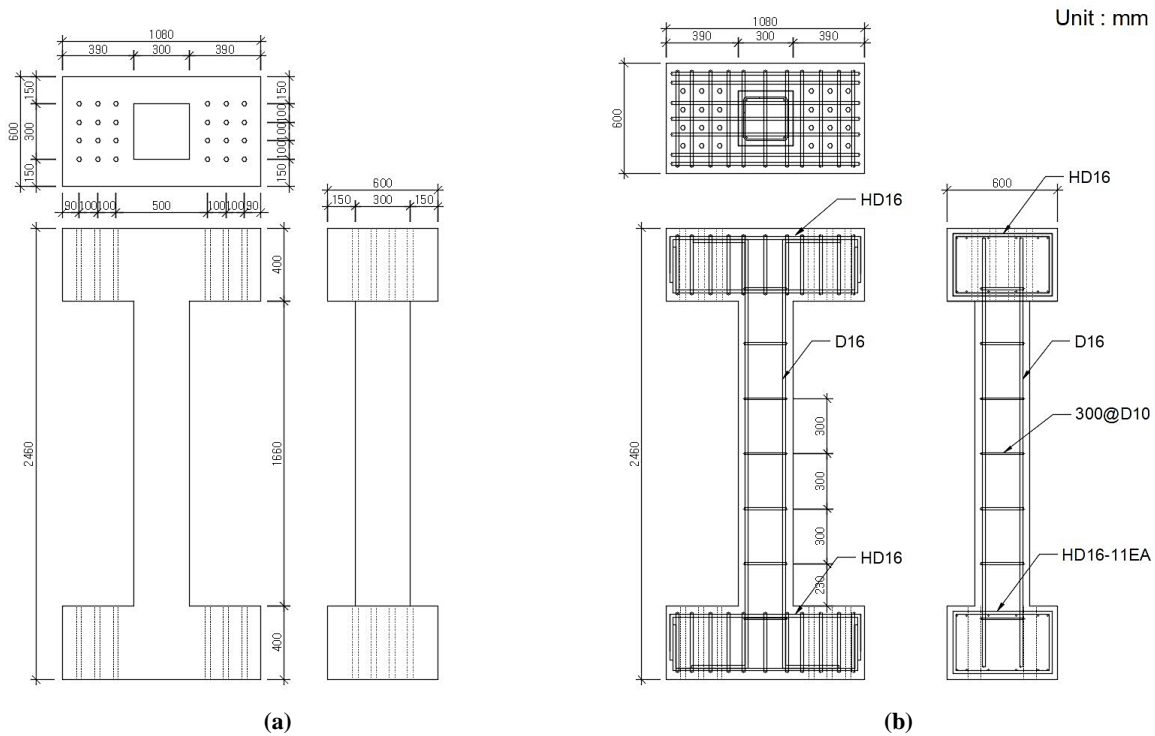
Test column: (a) cross section , (b) reinforcement layout (unit: mm)
